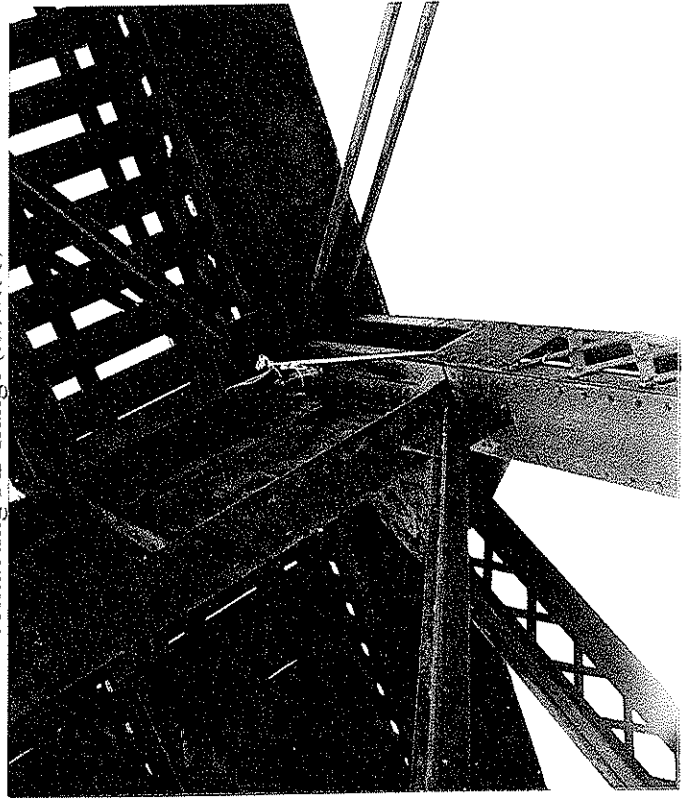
Span 2, Gages 308 - 312 at Floorbeam 5 and East & West Top Chords
